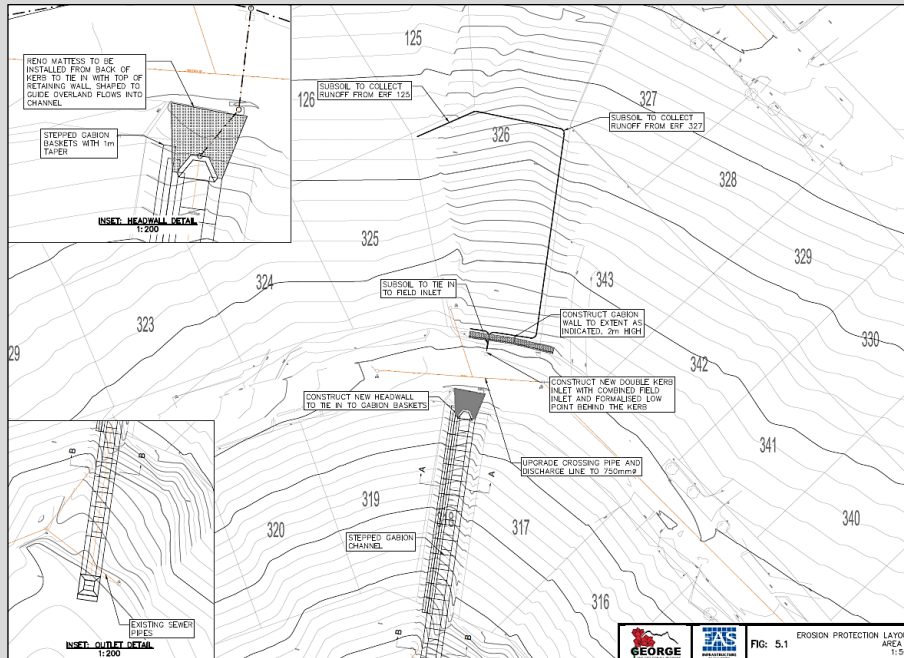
Erosion Protection Layout proposed for Erven 326, 318 & 139 (source: EAS Infrastructure Engineers).
